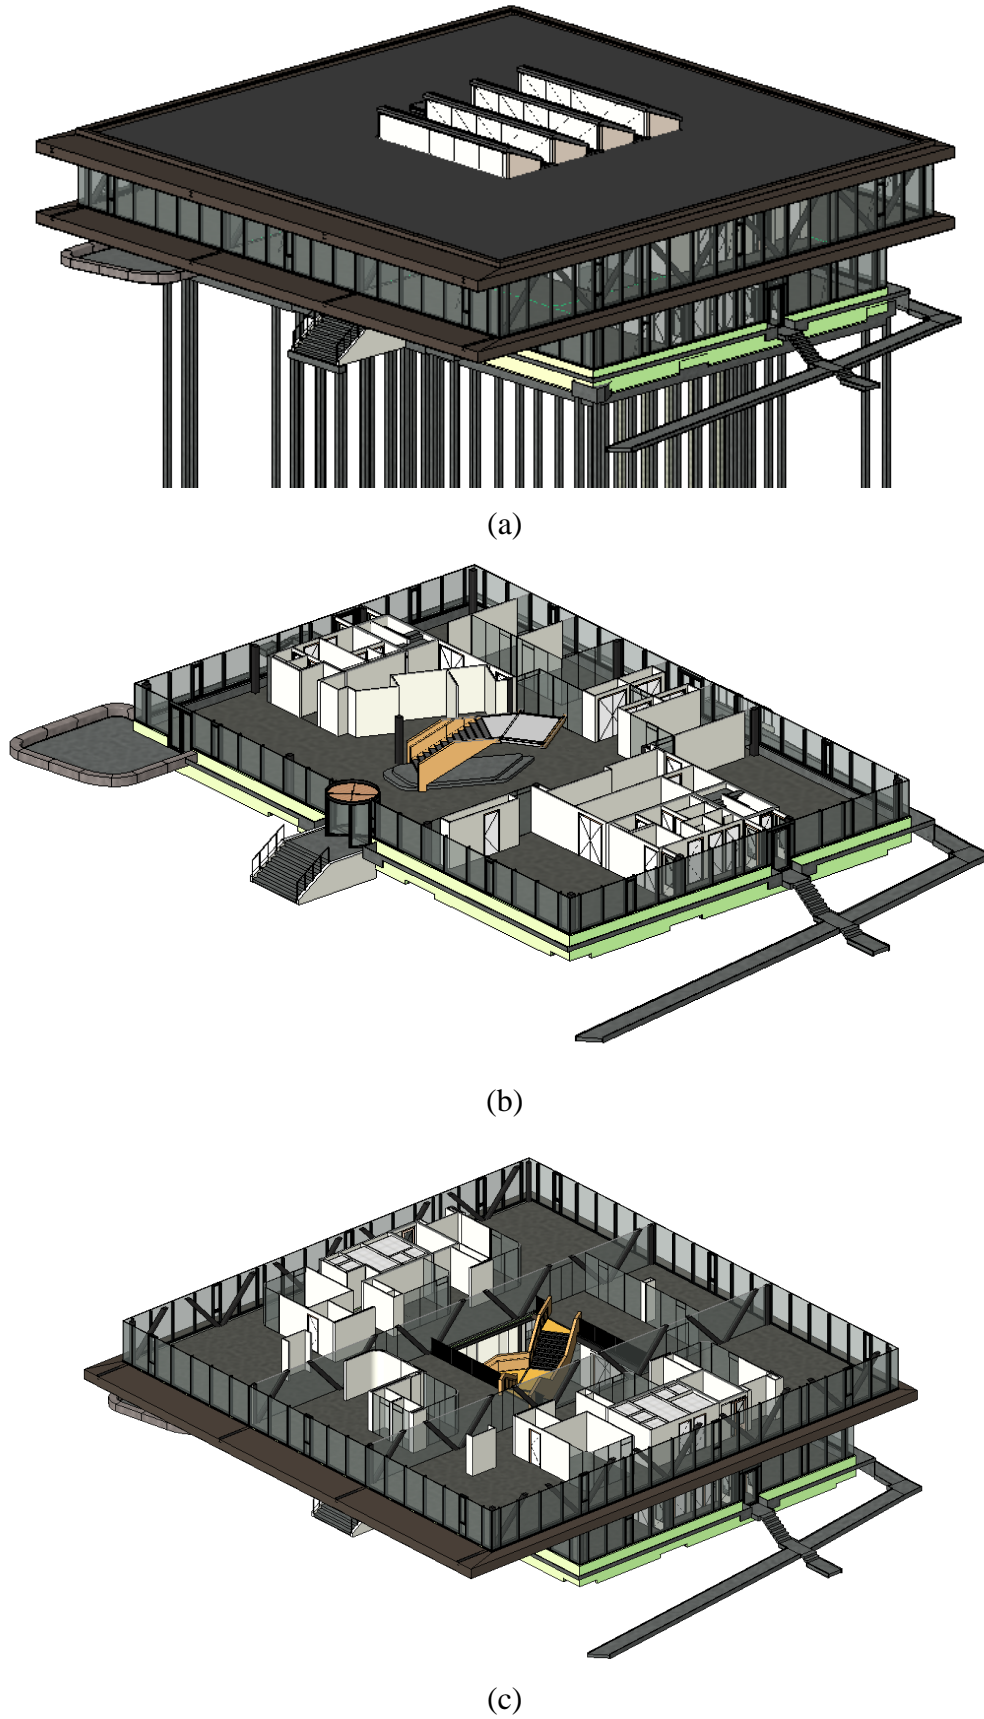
BIM model of the project in the Netherlands: (a) office building; (b) ground floor; and (c) first floor
